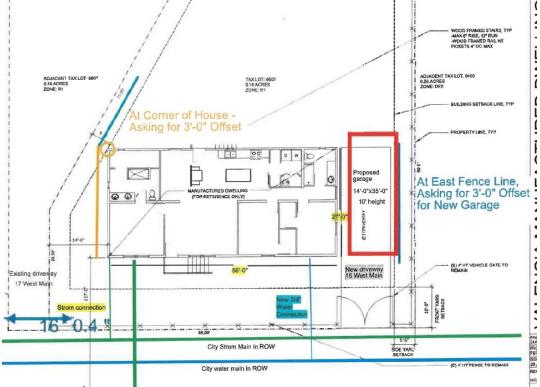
Applicant's site plan showing two variances to side yard setbacks.
